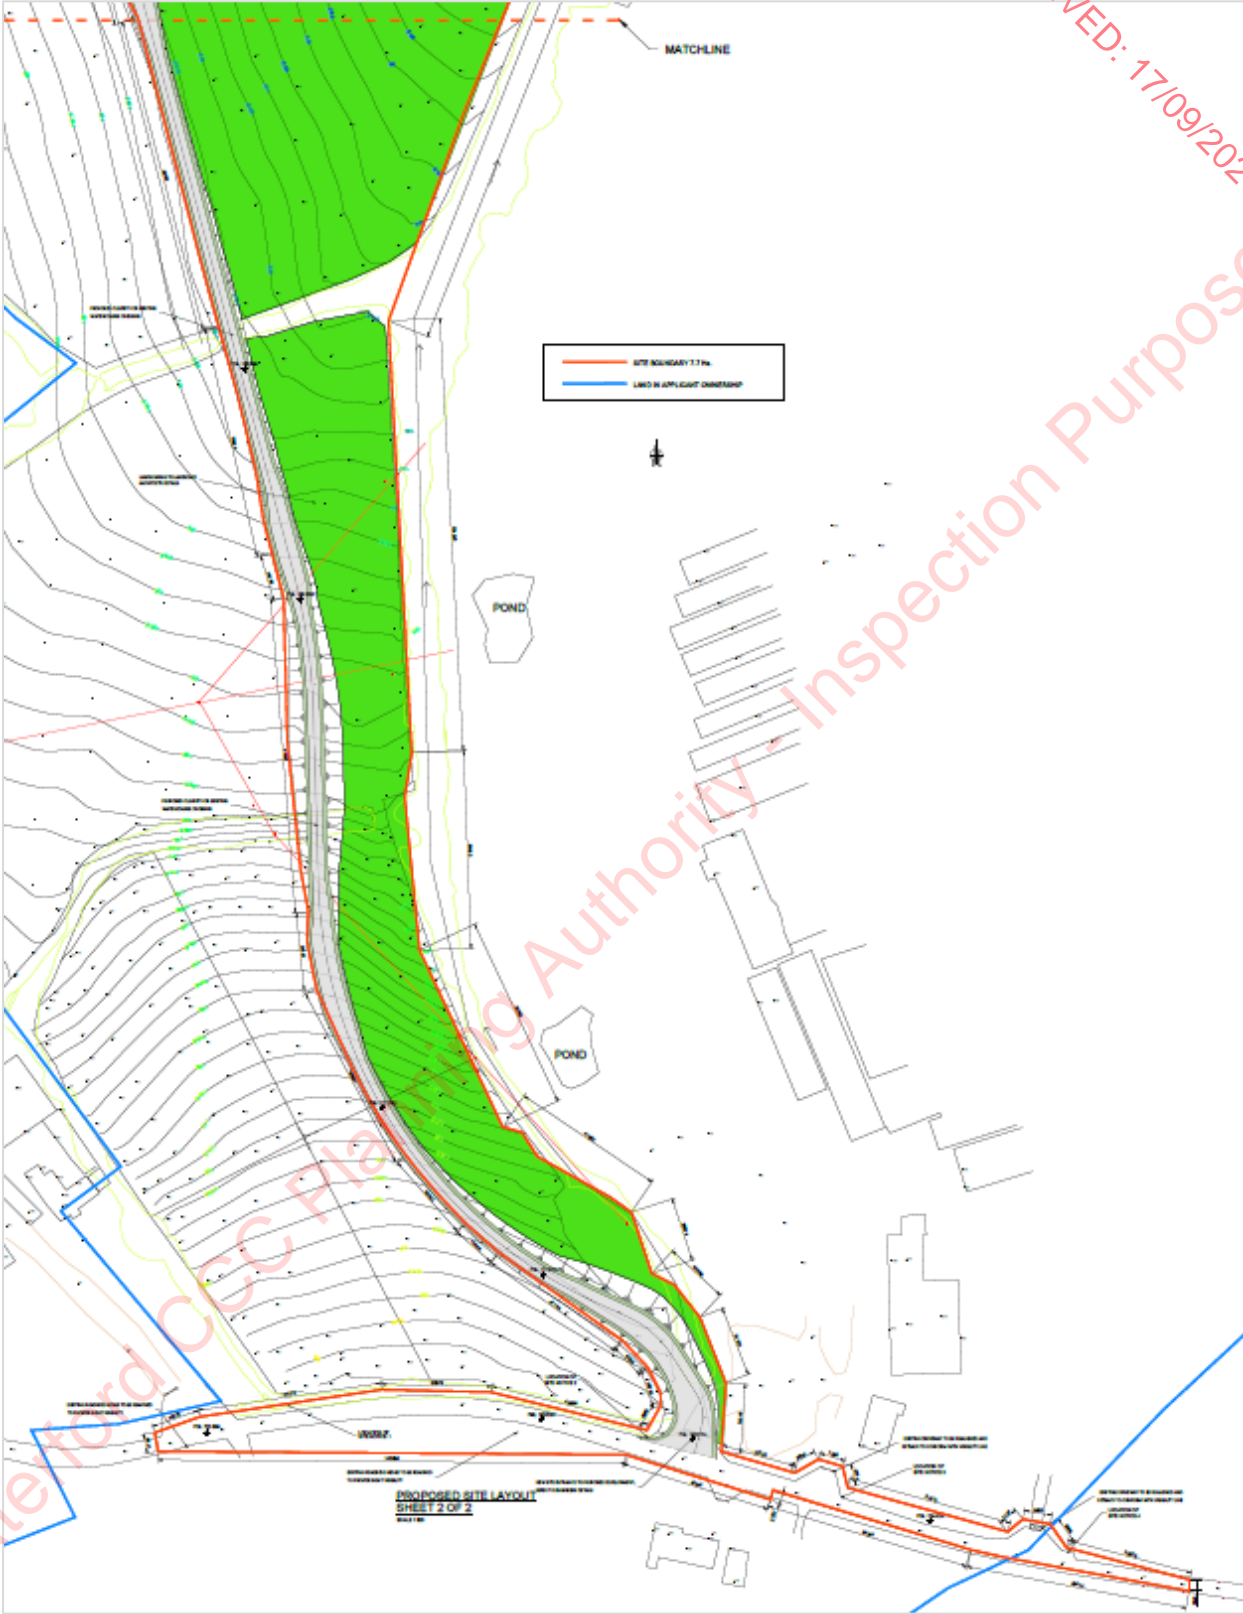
Proposed Site Layout – Access Road (Source: ORS)
